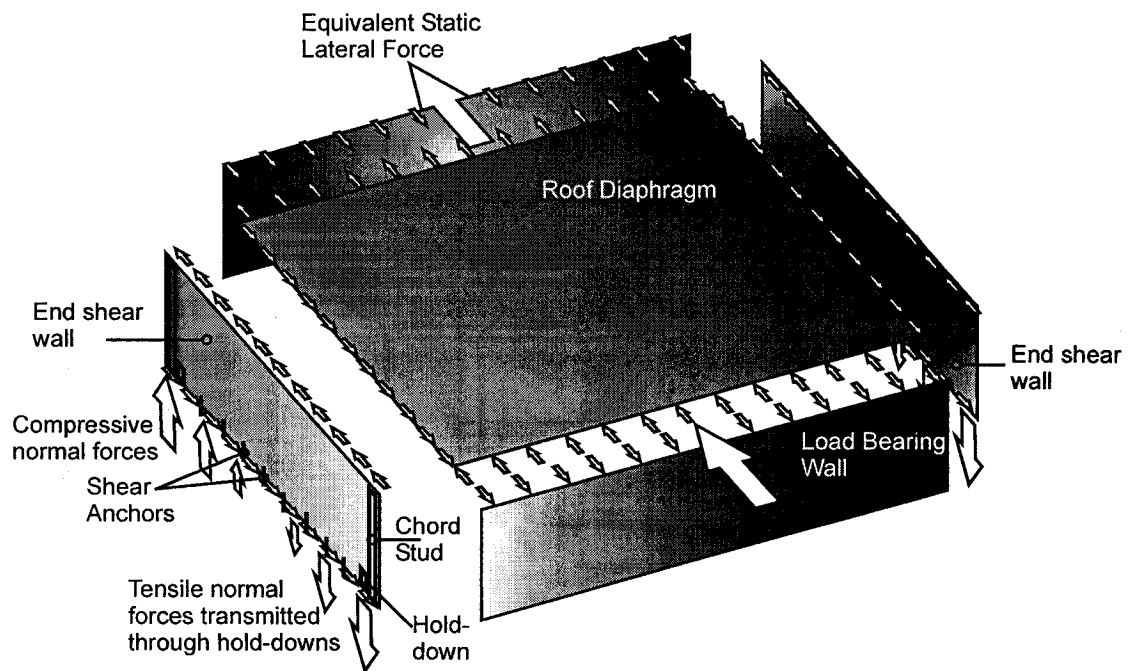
Transfer of lateral loads through roof diaphragm to end shear walls
